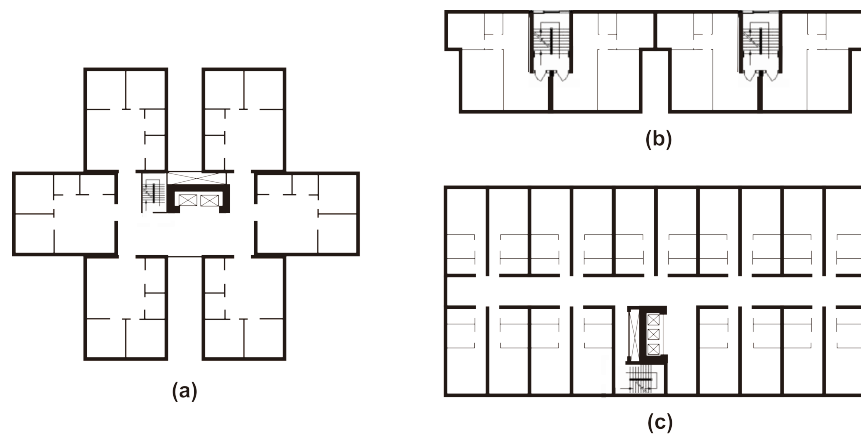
Different layouts of residential buildings in Bangkok: (a) tower-type; (b) unit type; and (c) corridor type [adapted from (Imano et al., 2008)].
